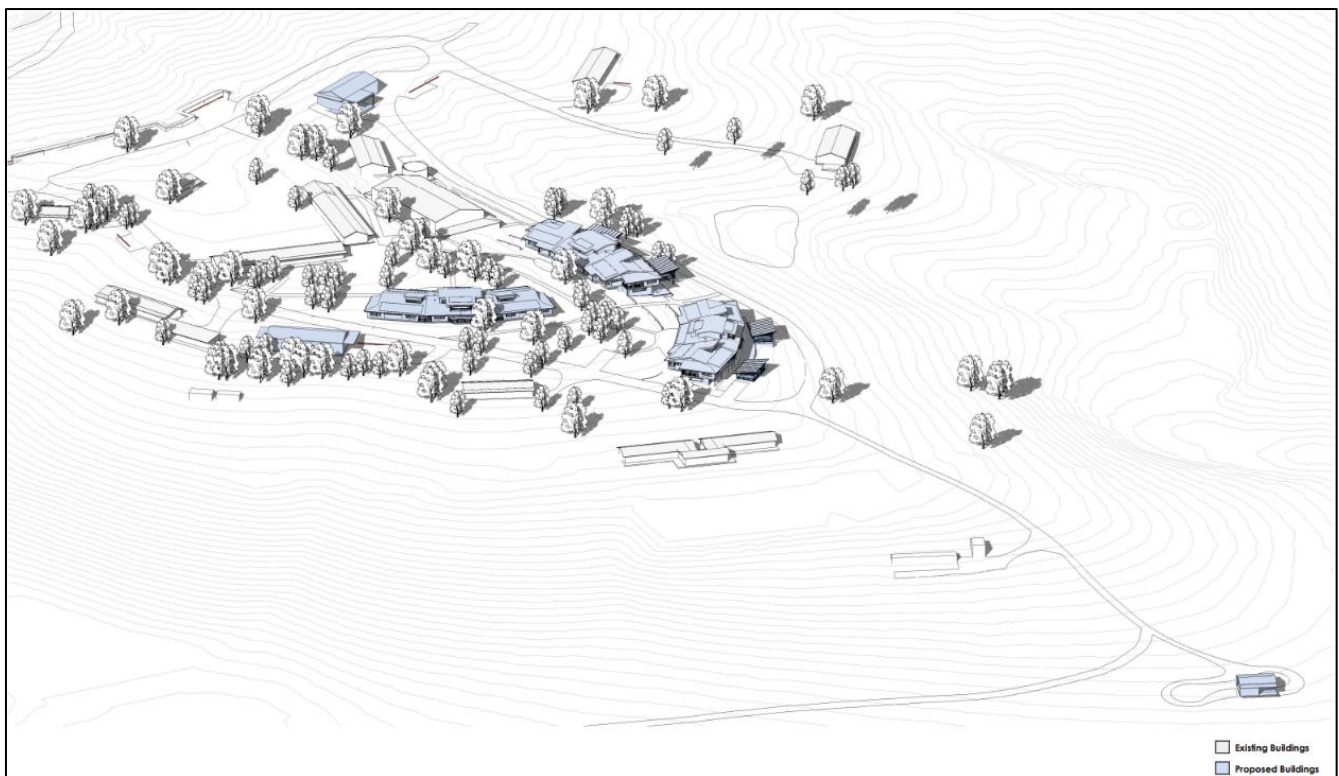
3D Site View (looking south-east) of proposed Stage 1 Development – source: Baxter & Jacobson Architects
